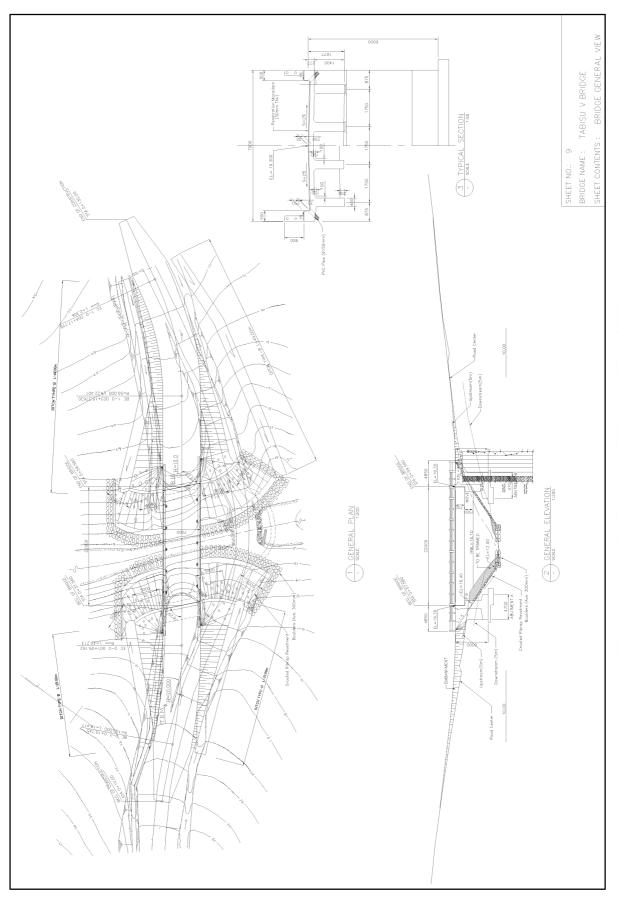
Bridge General View of TabisuV Bridge
